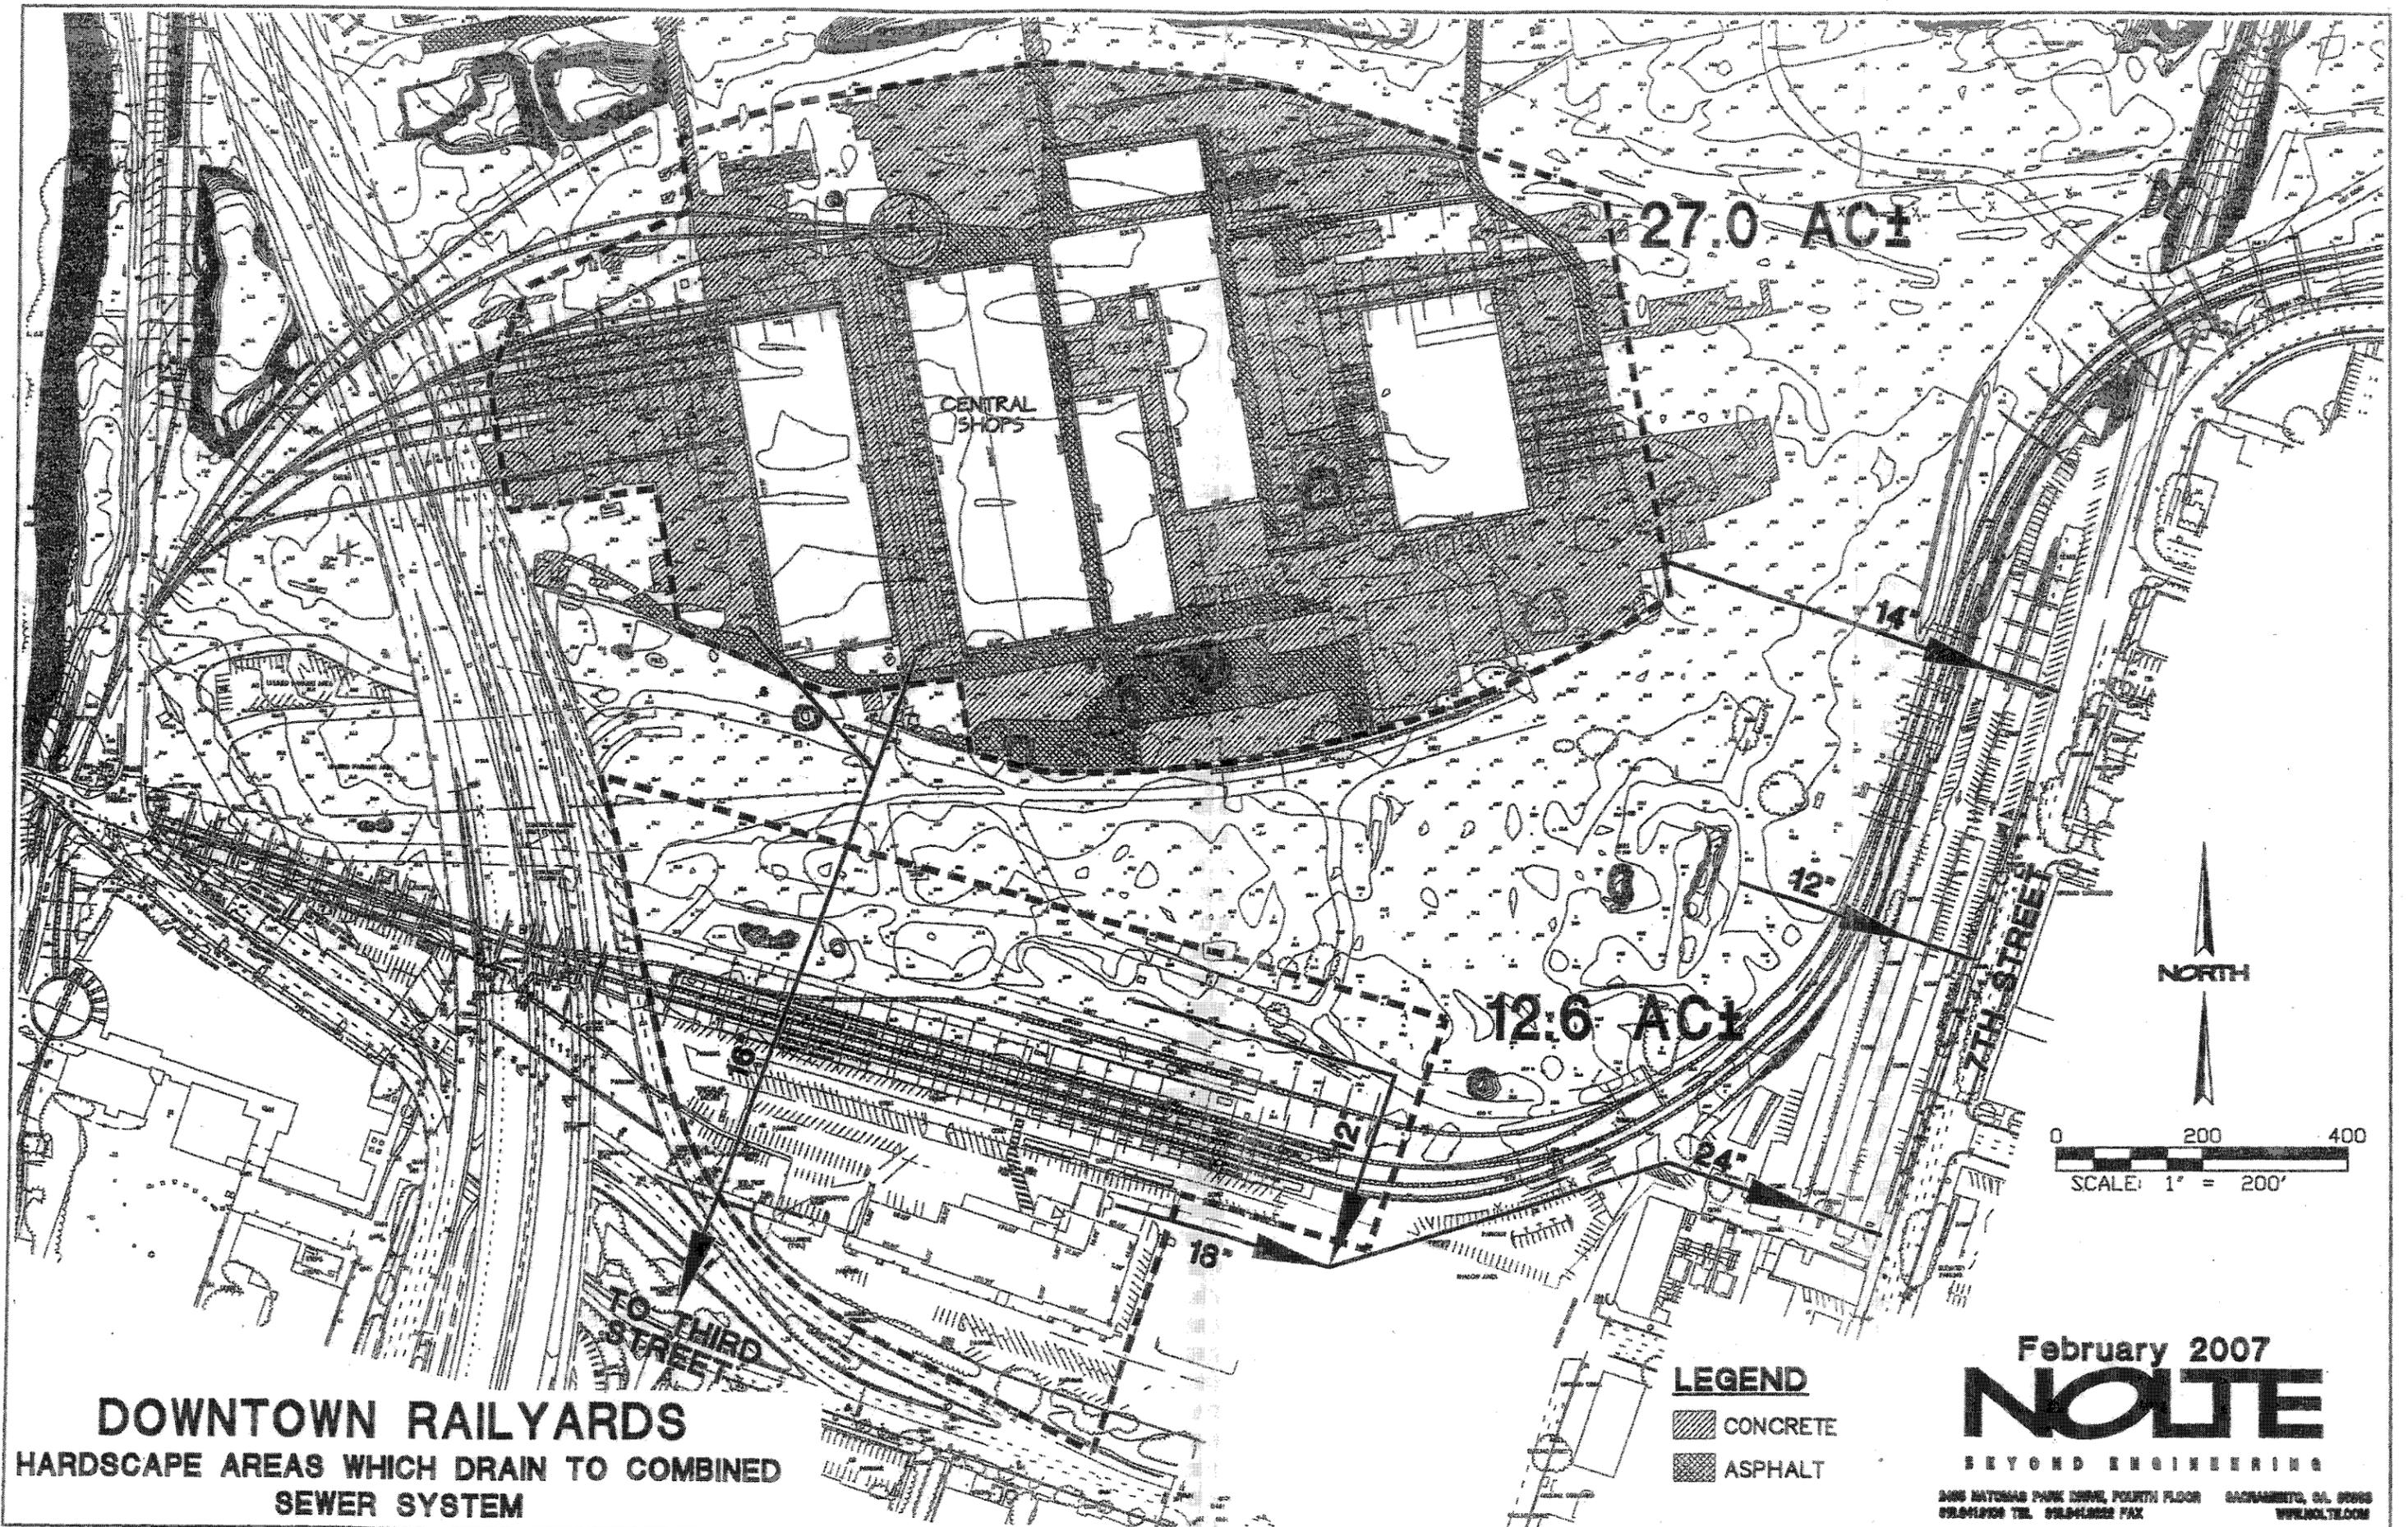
EXISTING HARDSCAPE AREAS WHICH DRAIN TO COMBINED SEWER SYSTEM
